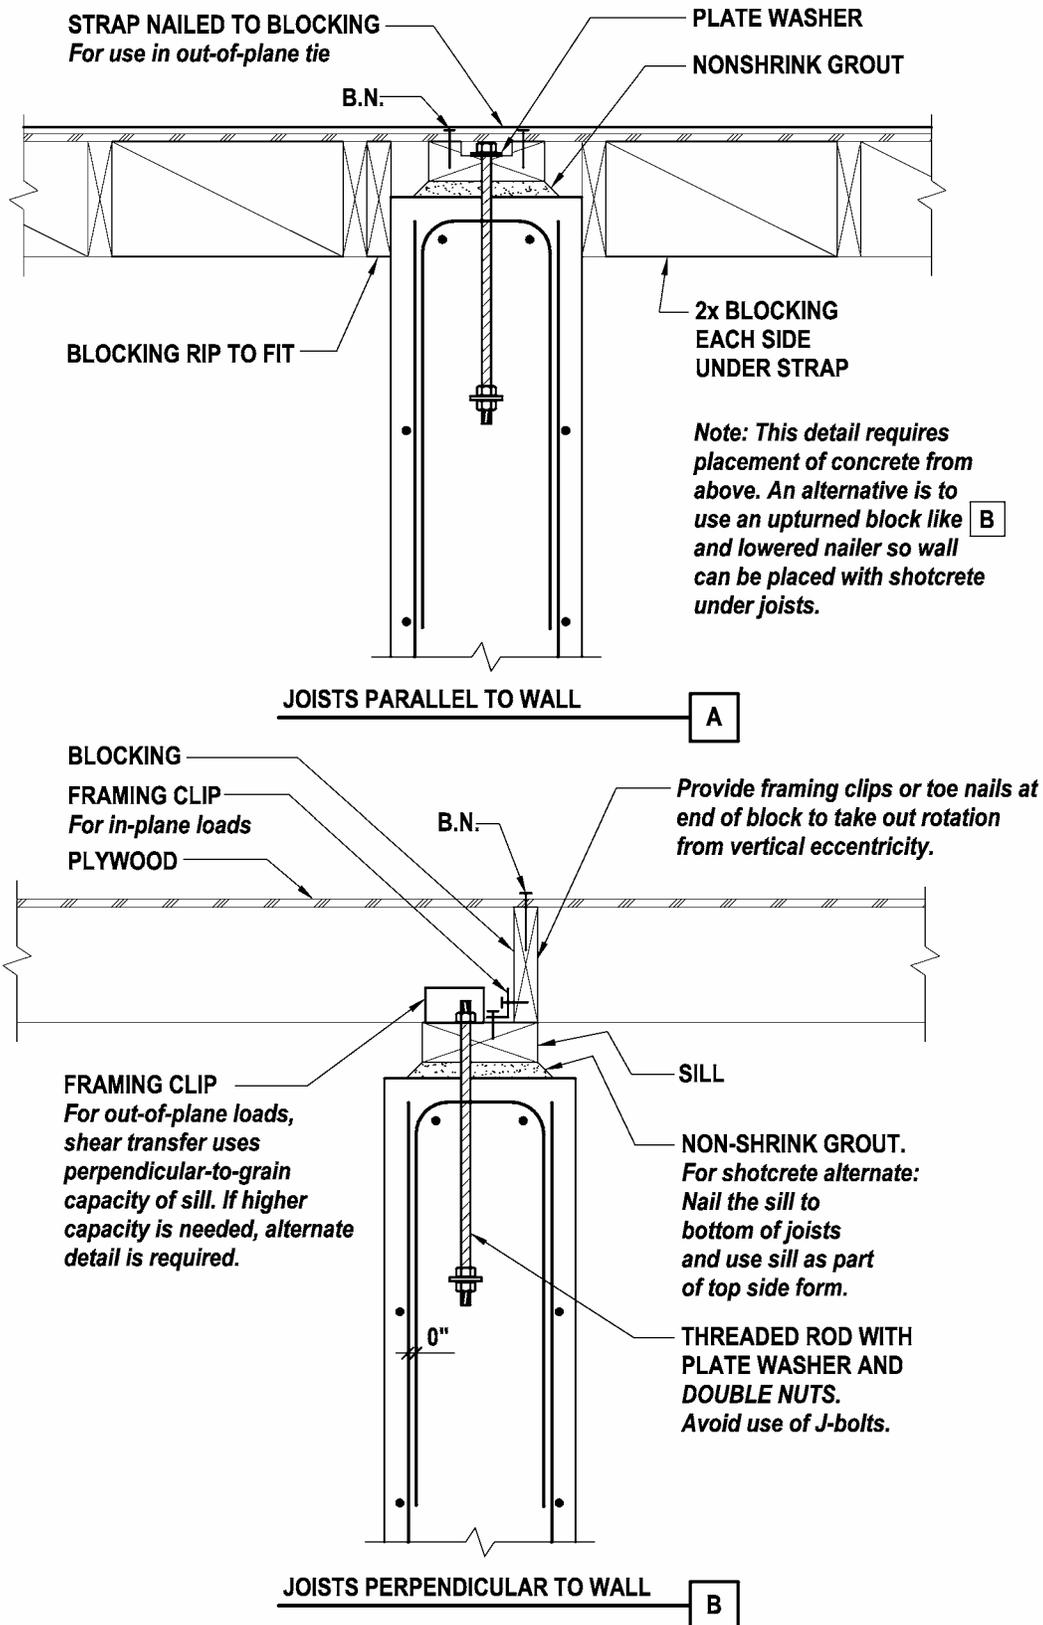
Connecting a Concrete Wall to an Existing Wood Roof at Interior
